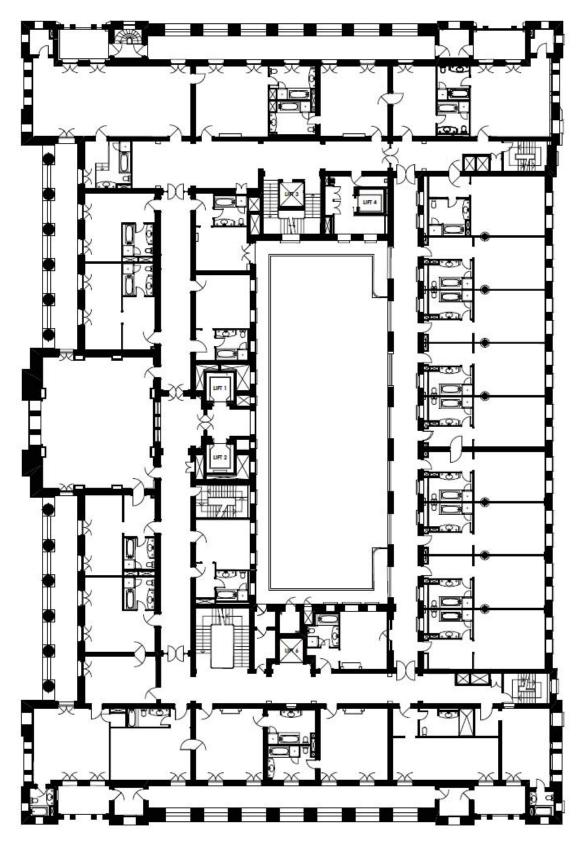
Floor Plan, Level 2 Source: ML Design 2016
